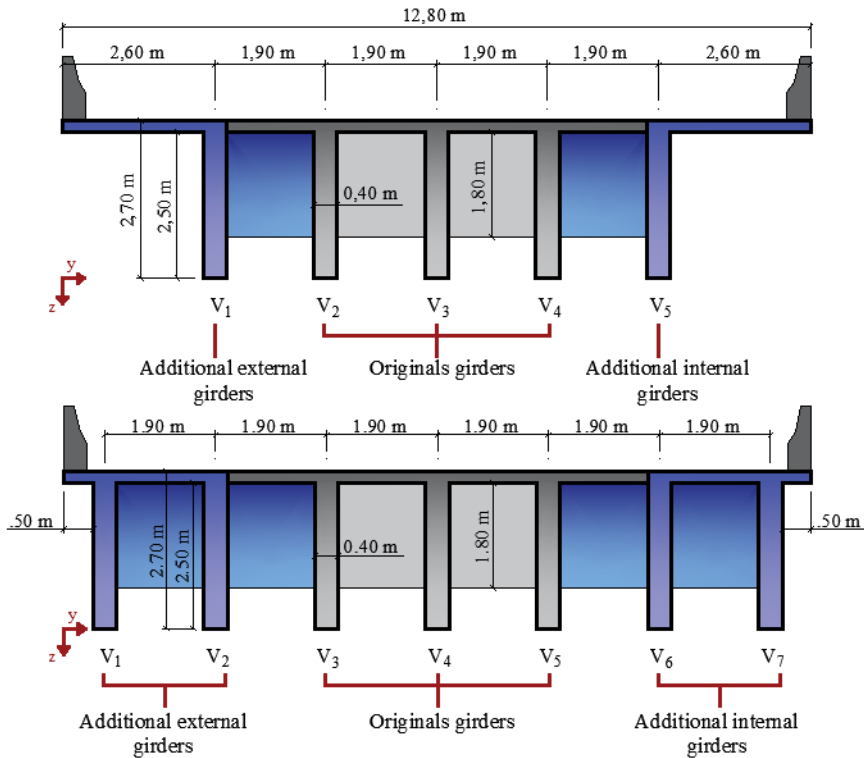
Cross sections after widening: (a) 5-girder model; (b) 7-girder model.
